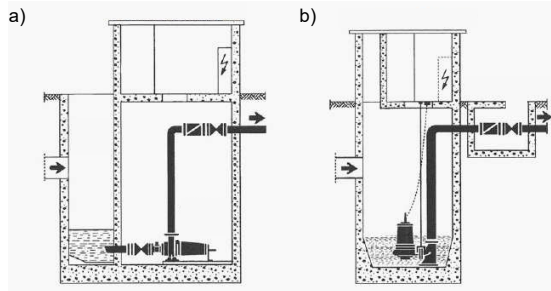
Sectional view of a suction chamber with a) dry-installed, b) wet-installed pumps after [3]
